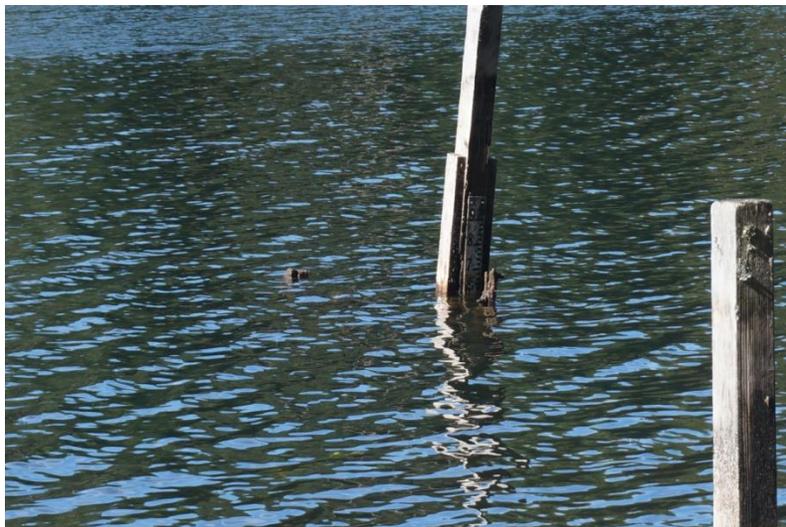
Maxwell Lake Dam Spillway. Looking from dam to left abutment. Note staff gauge immediately upstream of weir used to measure high lake levels above 3.0 m above MoE Datum (). May 2013.
